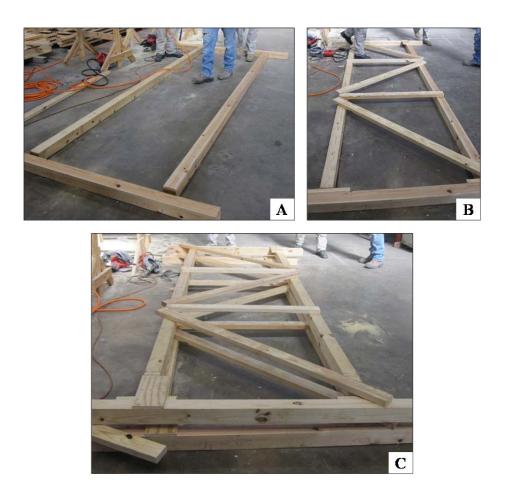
Fabrication of LP Photographs A) Layout of Main Elements B) Layout of Braces C) Using the First Side as a Guide for the Assembly of the Second Side
